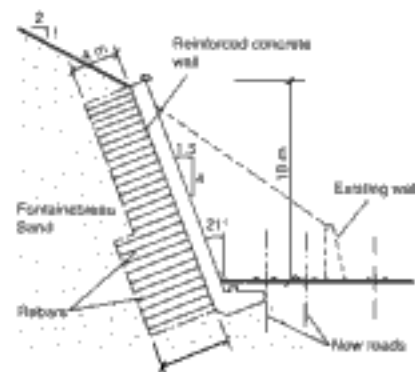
First soil-nailed wall at Versailles, France in 1972/73 (Project Clouterre¹⁰)
